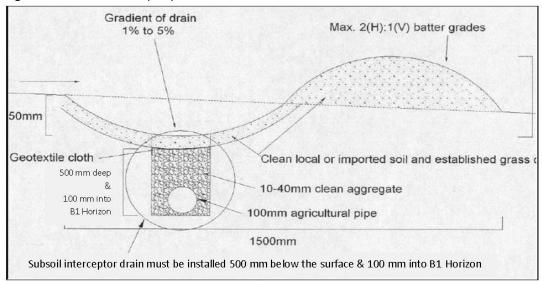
Cross Section: Upslope Diversion Drain<sup>2</sup>.
